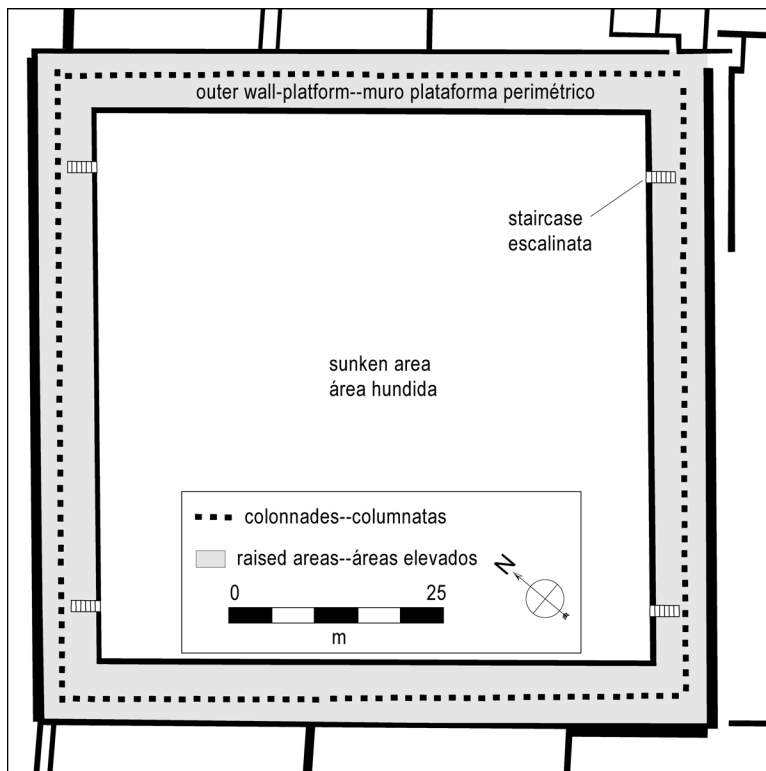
Plan reconstruction of Plaza-A, Huambacho.
